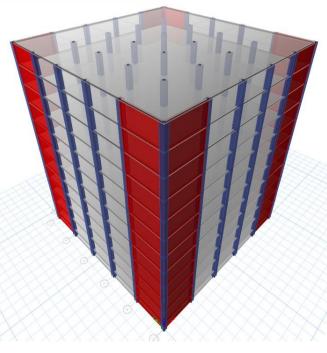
3D model of flat plate without edge beam with shear wall.
